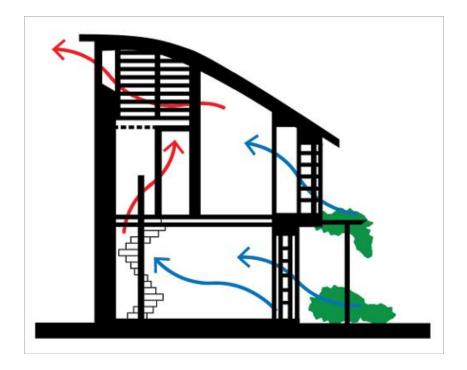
Convective air movement in a building Source: (Chris, 2008)
